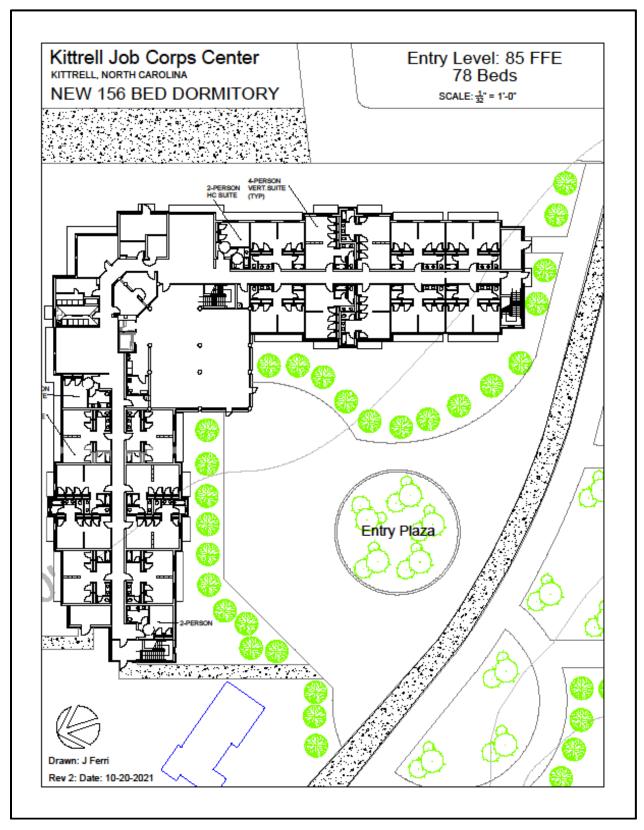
Proposed Action Alternative - Ground Level Floorplan (North is to the Left)
